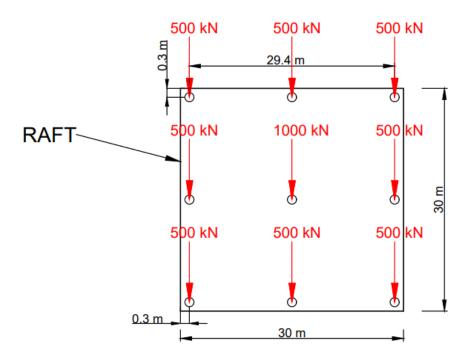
Plan Showing Arrangement of Loads in Pile-Raft Foundation
